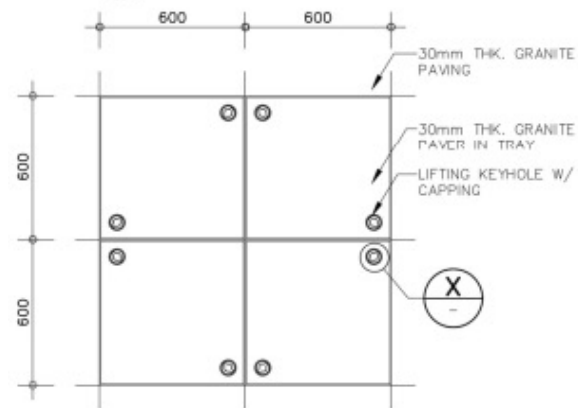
DETAIL OF MANHOLE COVER AND FRAME (RECESSED TYPE, DOUBLE SEAL)
